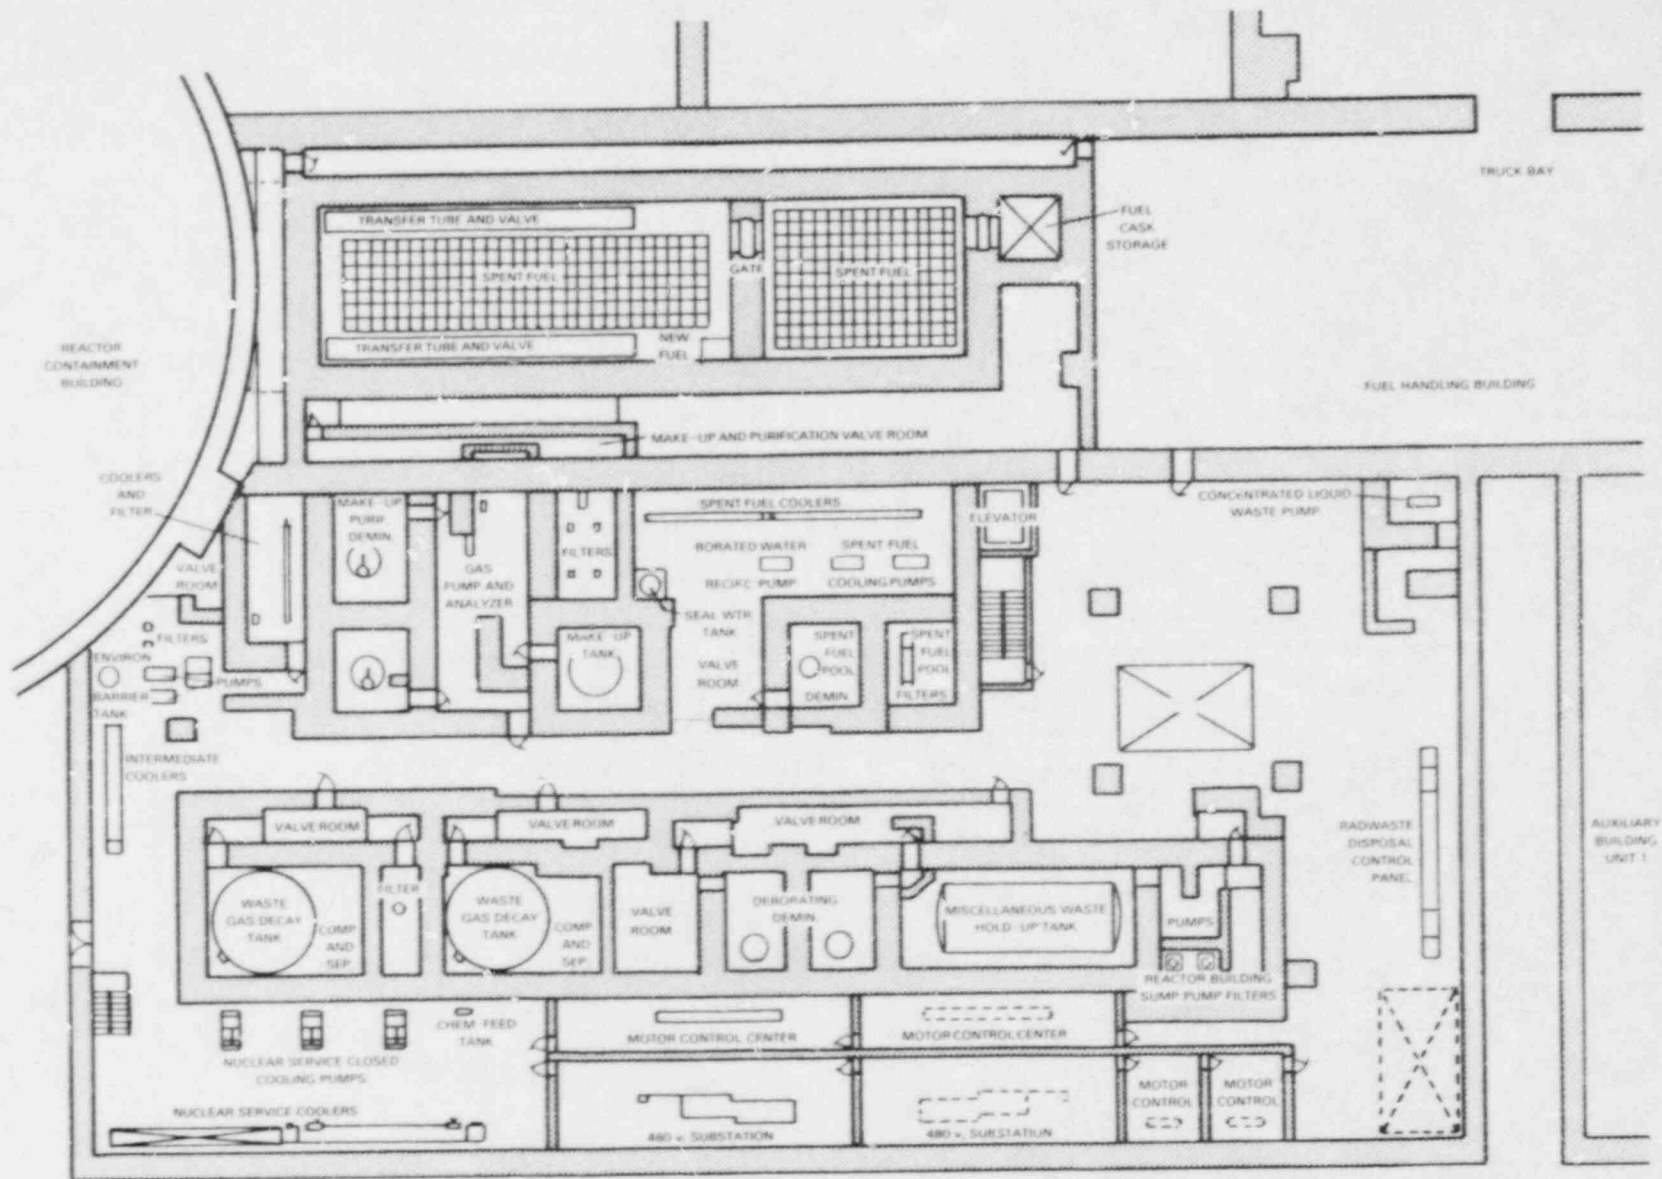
Plan View of Auxiliary and Fuel-Handling Building (305-foot elevation)
